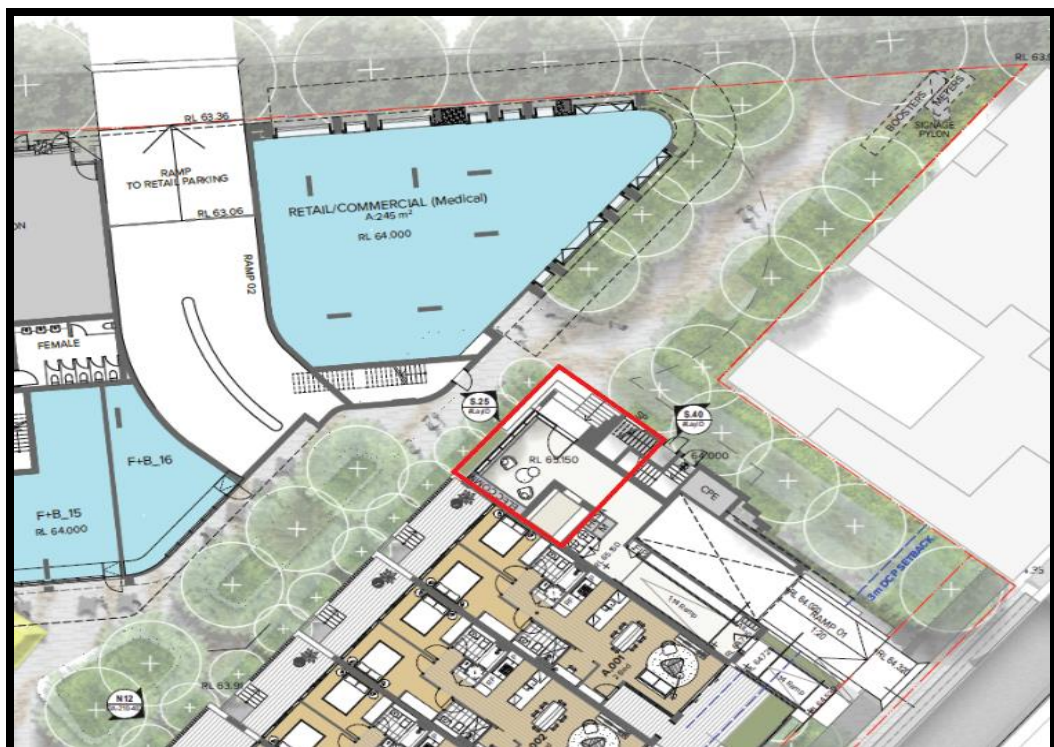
Plan showing area of building that could be reduced (outlined in red)
